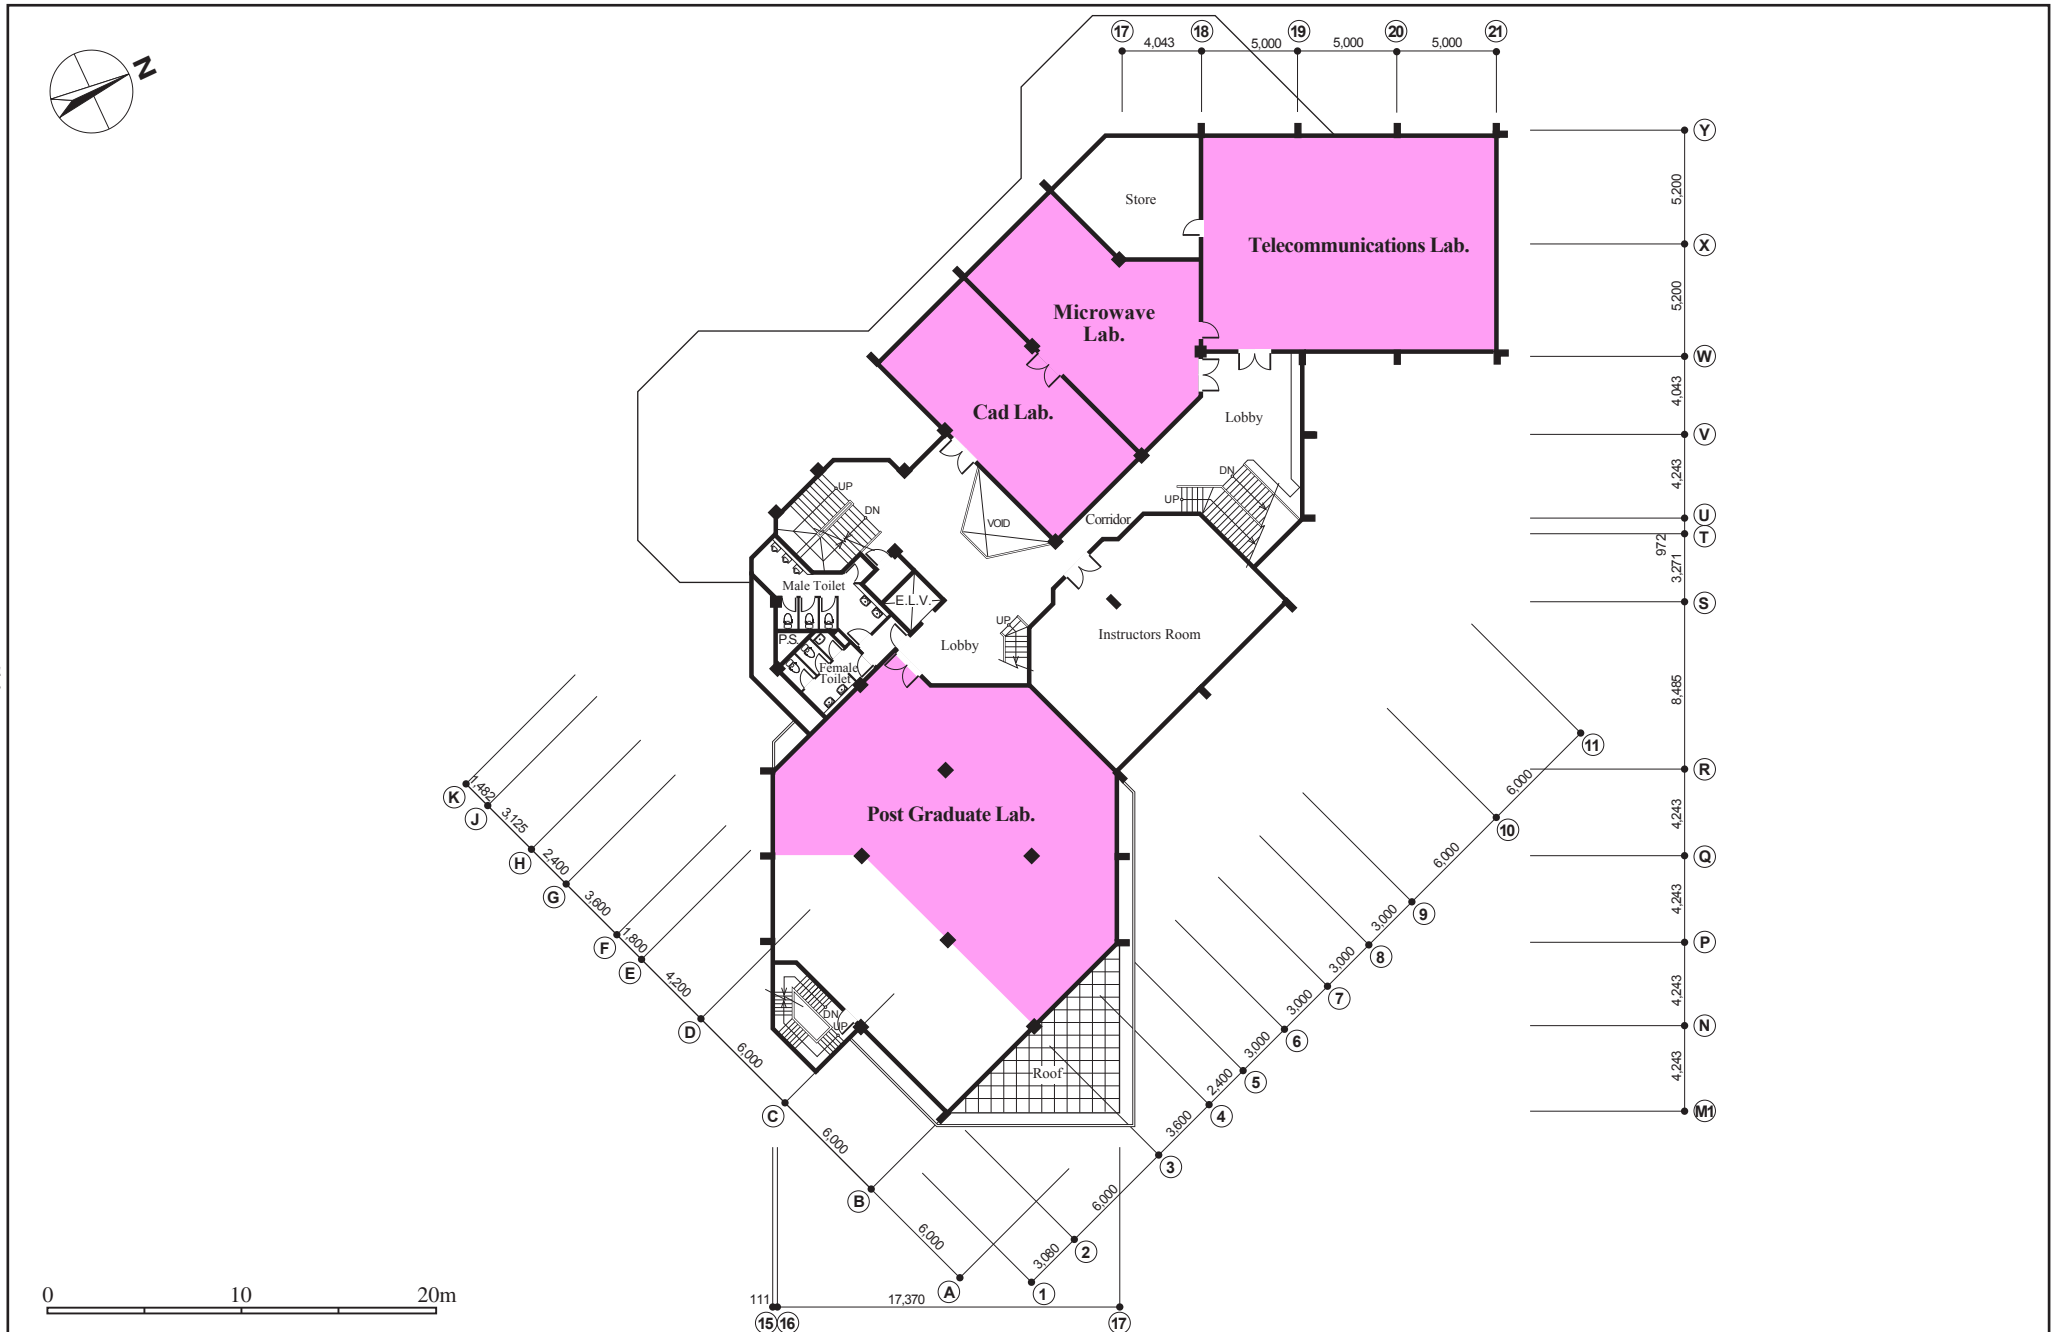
Third Floor Plan of New Building for Department of Electronics & Telecommunication Engineering
